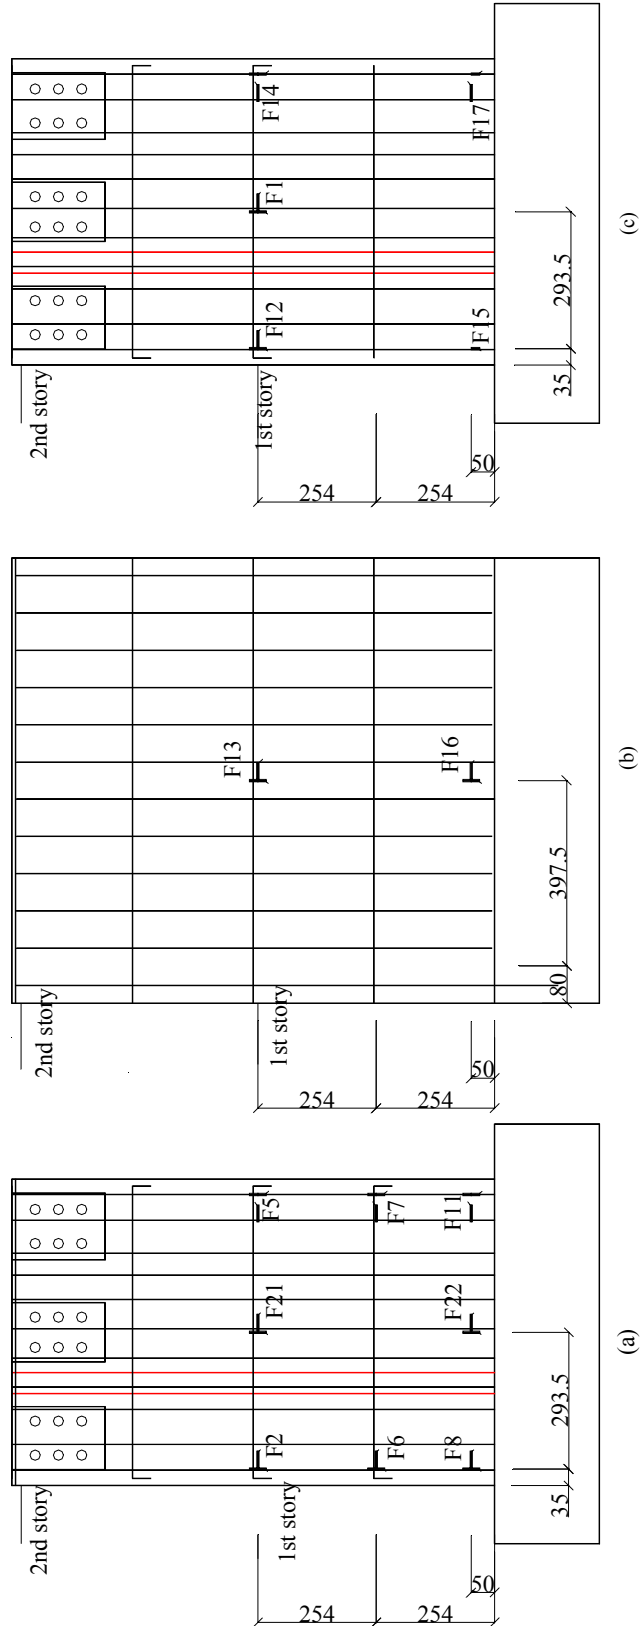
Strain gauges on the FRP of the wall (a) left flange wall (b) web wall (c) right flange wall
